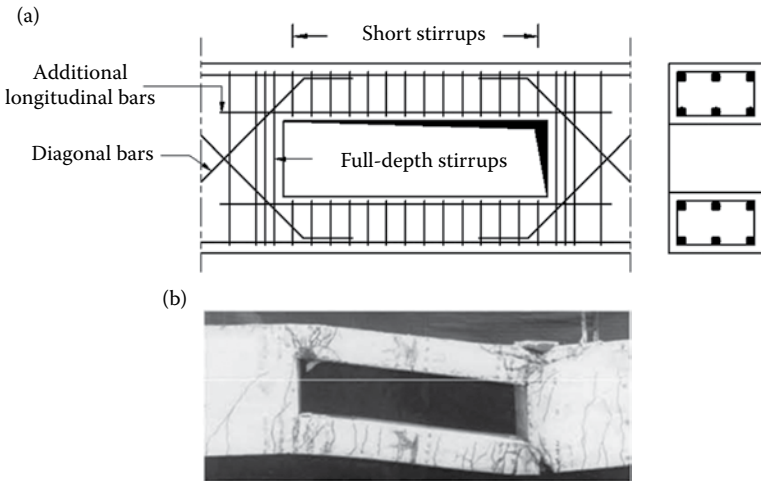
Reinforcement details around large openings in a shallow beam and expected failure mode: (a) suitable reinforcement detail and (b) corresponding failure mode.
